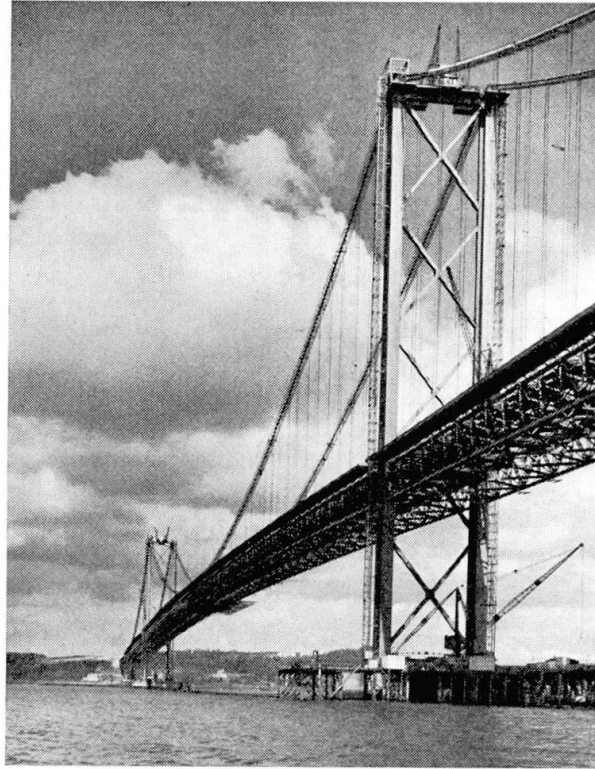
A view of the bridge after junction of deck steelwork at mid span.
